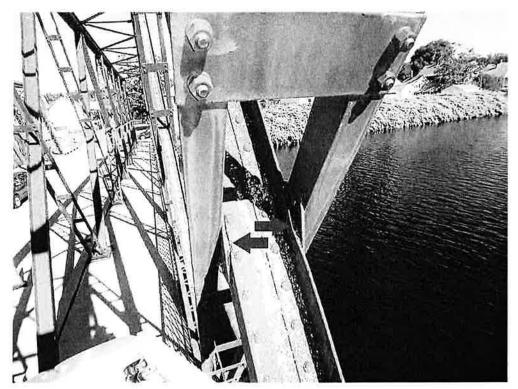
North tower outer truss, member U16-L14 at M15 – flanges have section loss at the edge.
